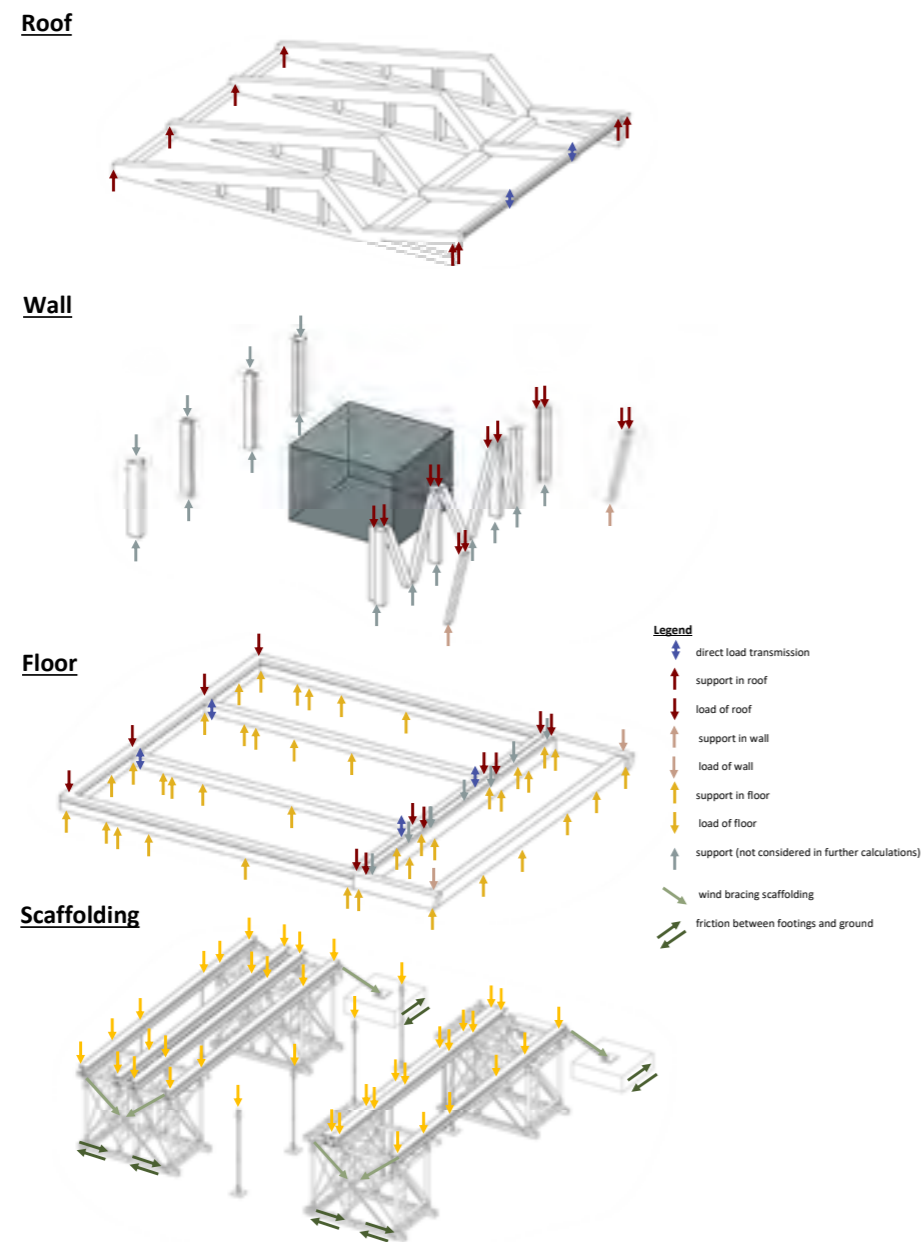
45. Structural design HDU – force diagram vertical loads
